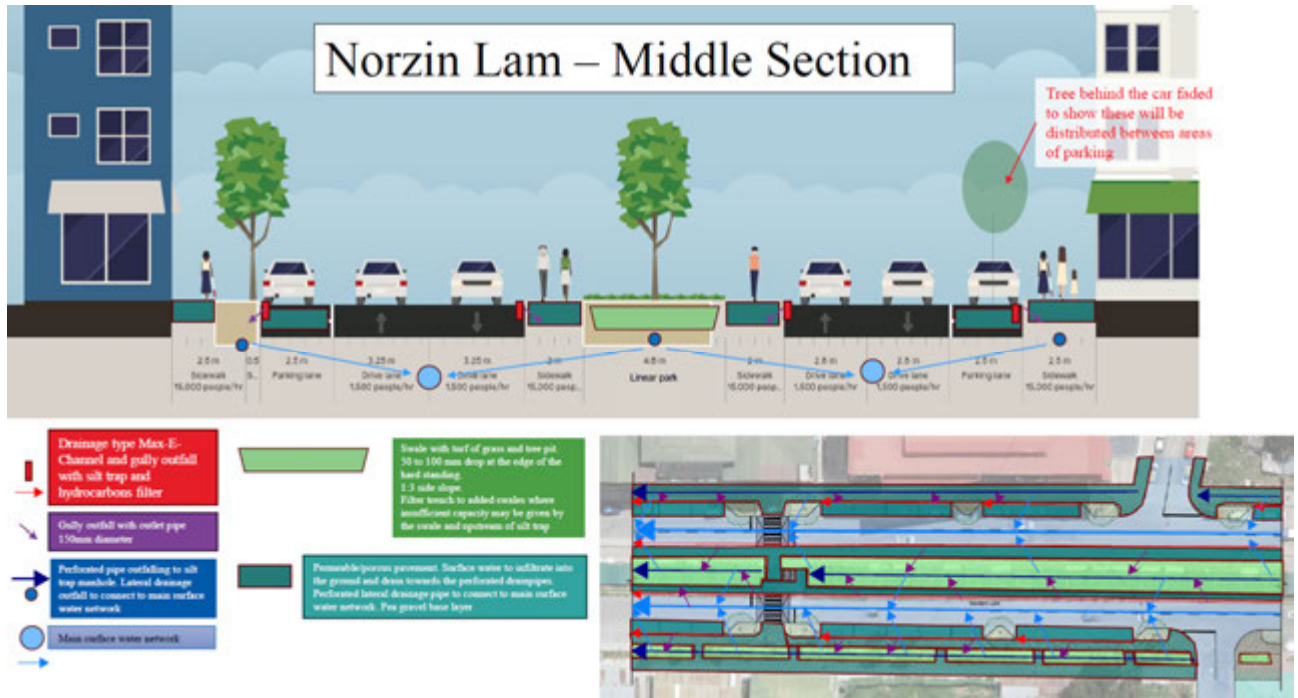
Norzin Lam Street Section Plan with SuDS Infrastructure Management Plan
